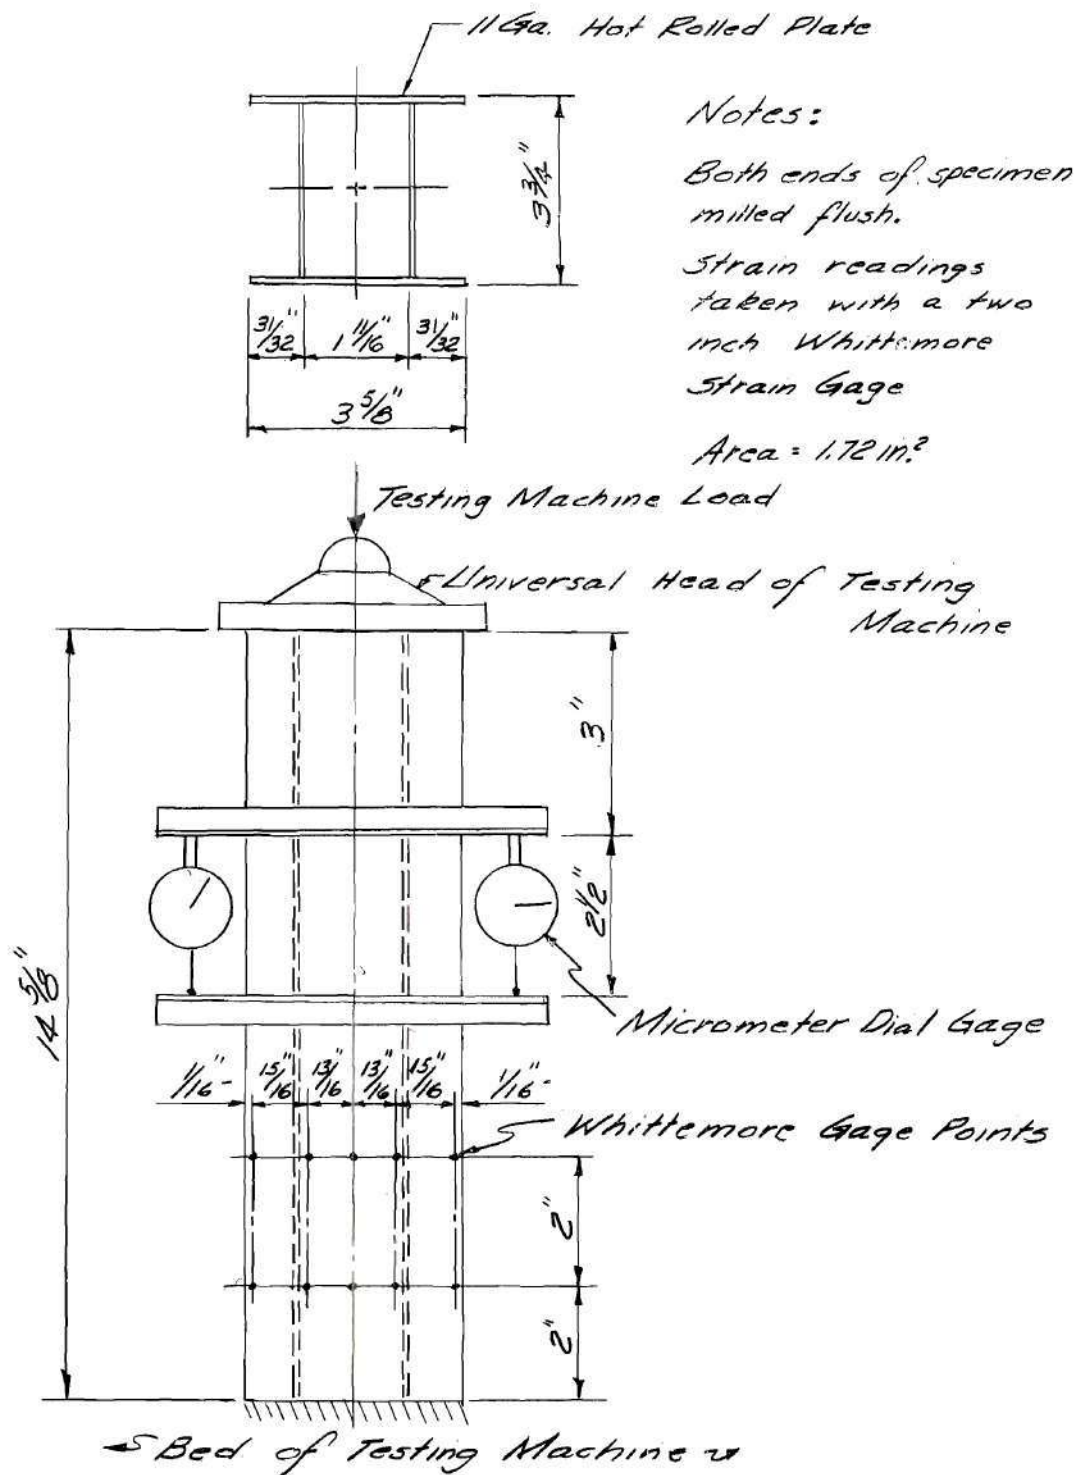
Test Arrangement and Instrumentation for Compression Test C-1
